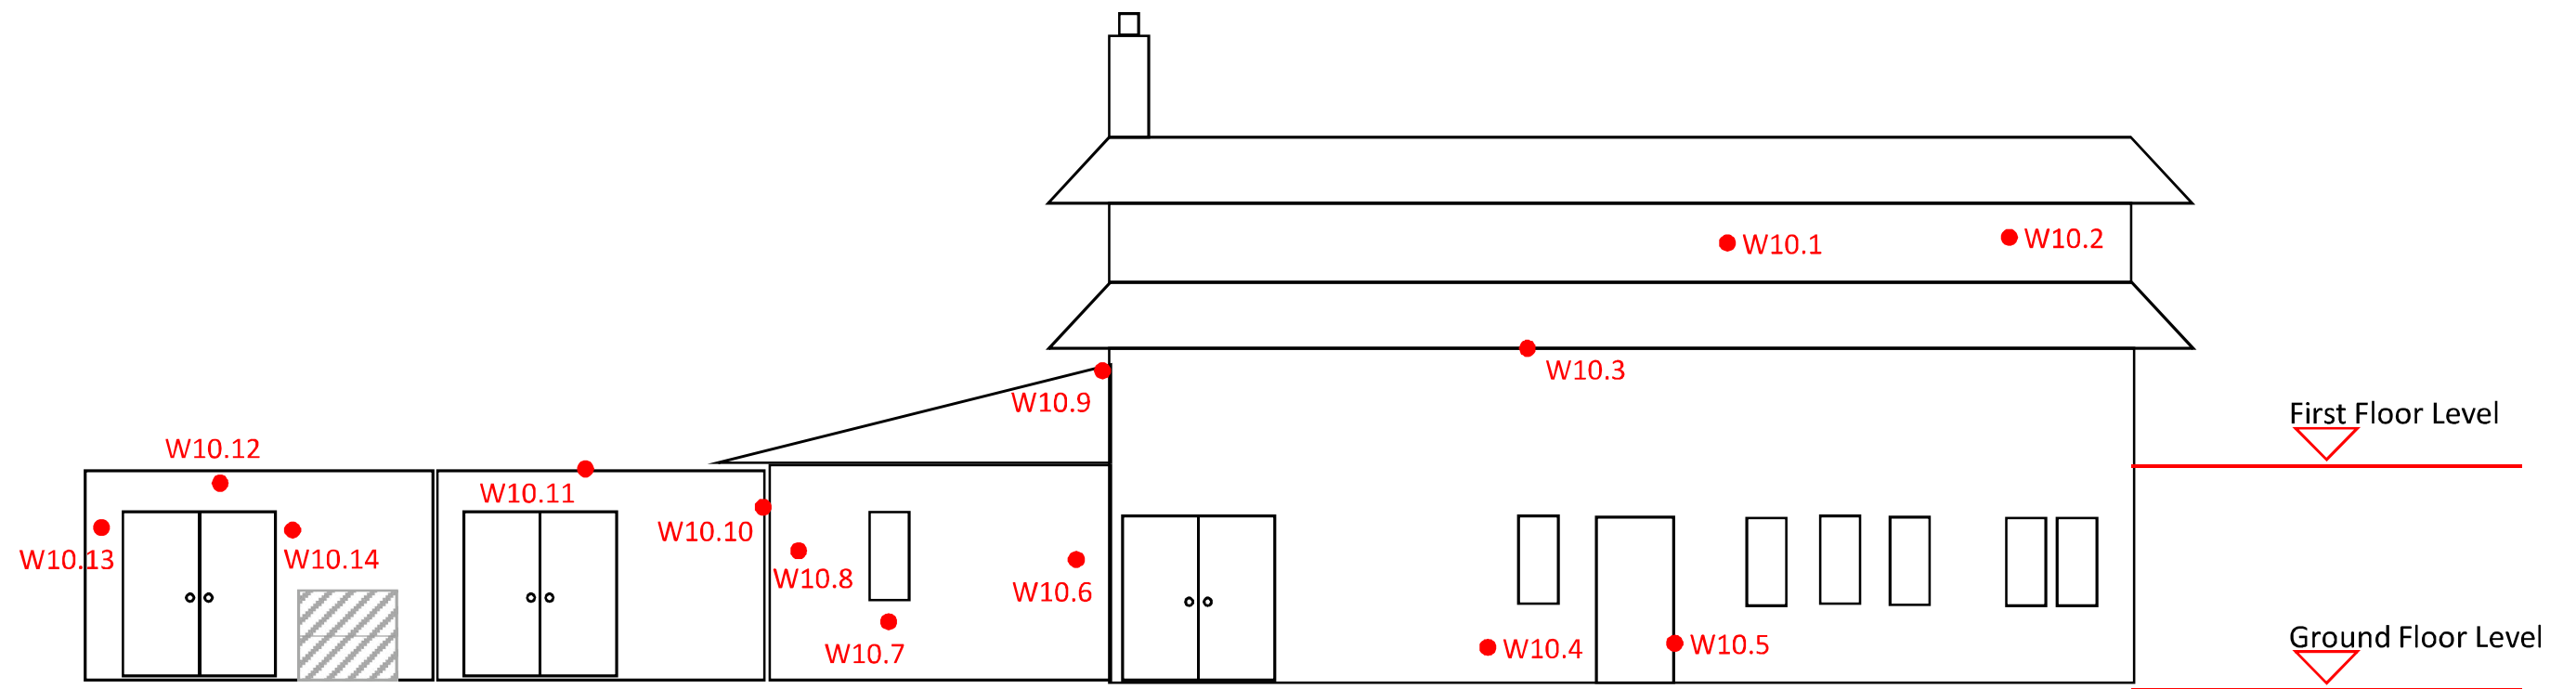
Elevation W10 of Station Hotel Building showing Defect/Observation Locations
